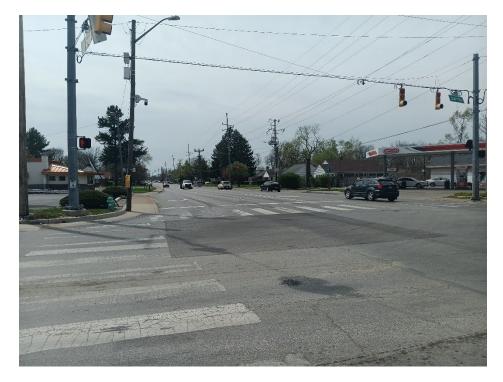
Looking south down Keystone Avenue from 35<sup>th</sup> Street.
